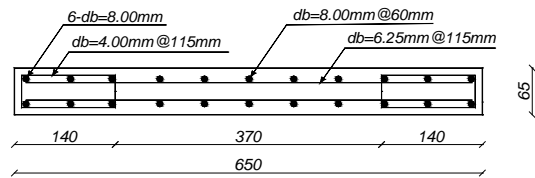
Cross-section and reinforcement details of the walls (dimensions are in mm)
